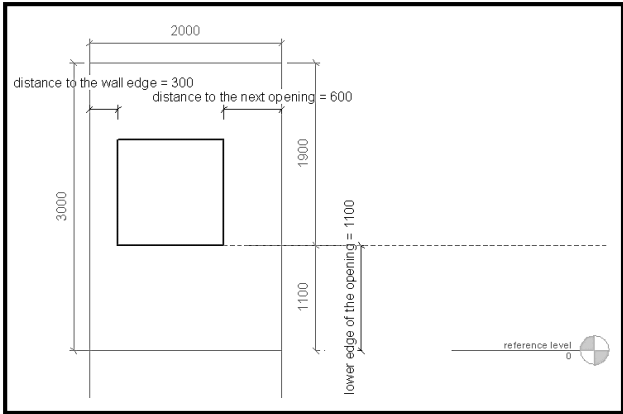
Distances of the opening in the wall-element are preconfigured as parameters
